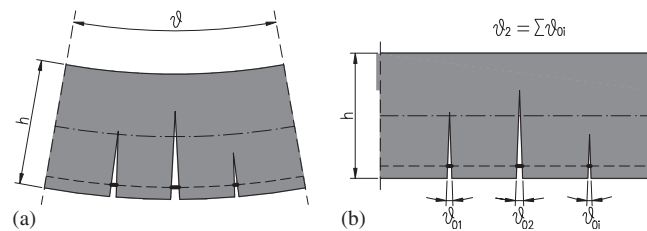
(a) Rotation under loading and (b) residual crack opening at rest of a cracked RC element.
